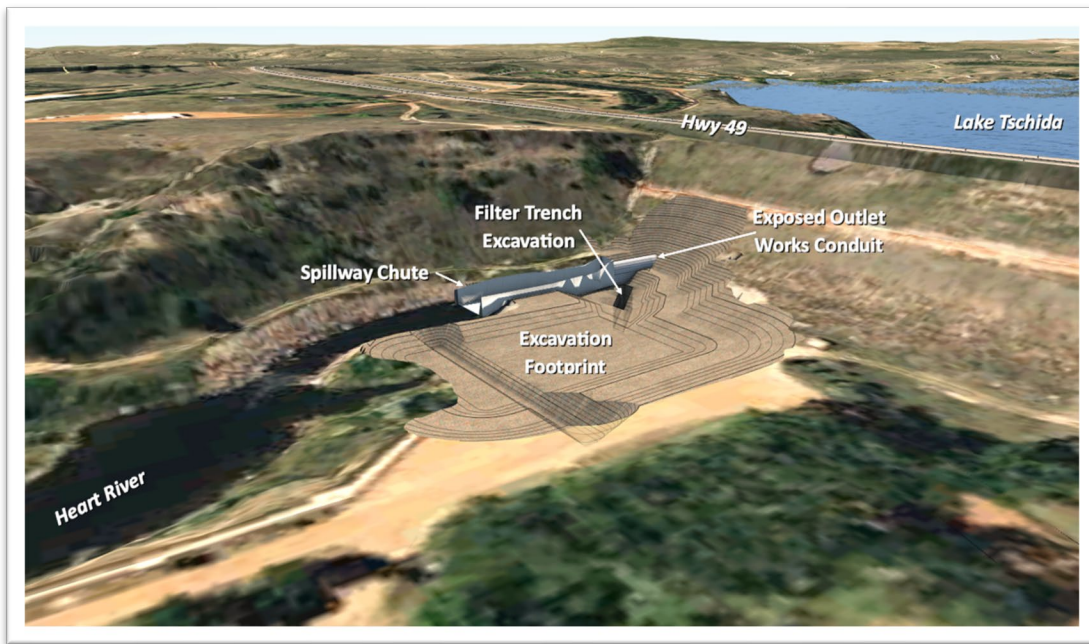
Rendering of proposed excavation at the downstream side of the dam.
